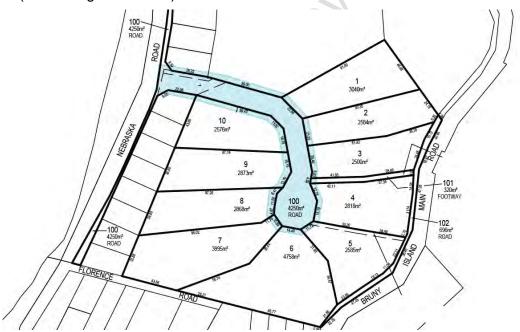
modified extract from advertised plans showing proposed 'Little Beach View' in blue
